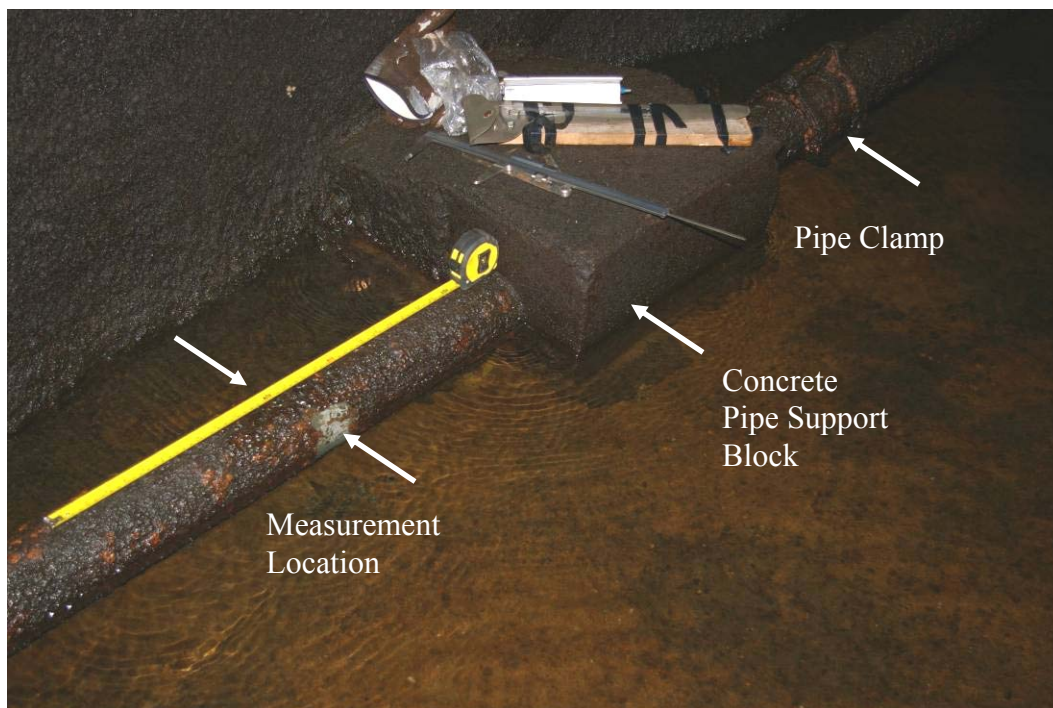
(August 15, 2007) East Supply Tunnel – Drain pipe measurement Location #1 (approx. 12 m downstream from Beaver Creek Bulkhead).
